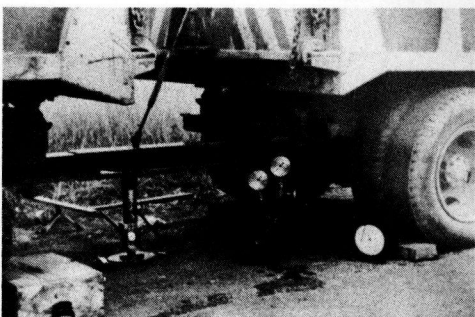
Close-up of Loading Equipment Used During 1949 - Showing Jack, Plate and Pump Arrangement - State of New York
